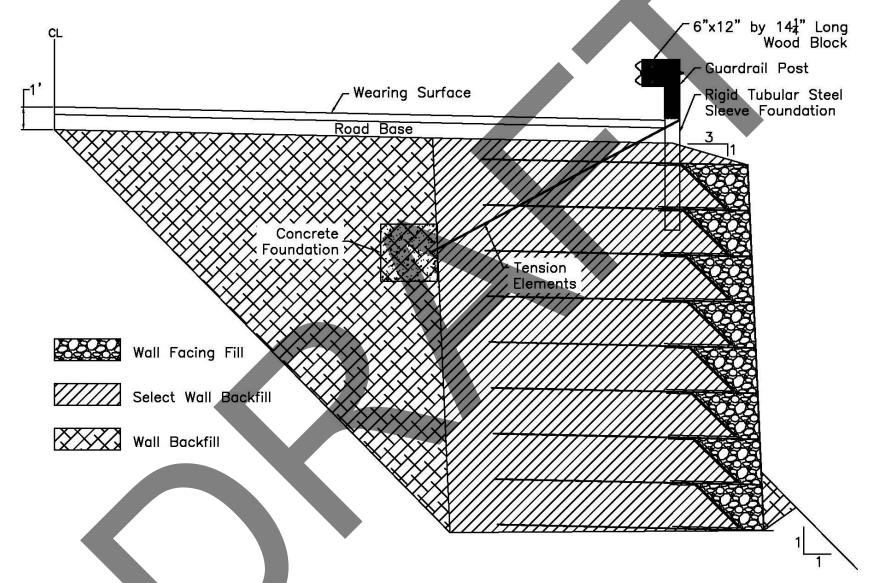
Schematic. MGS System with Rigid Sleeve, Concrete Foundation, and Tension Elements.
